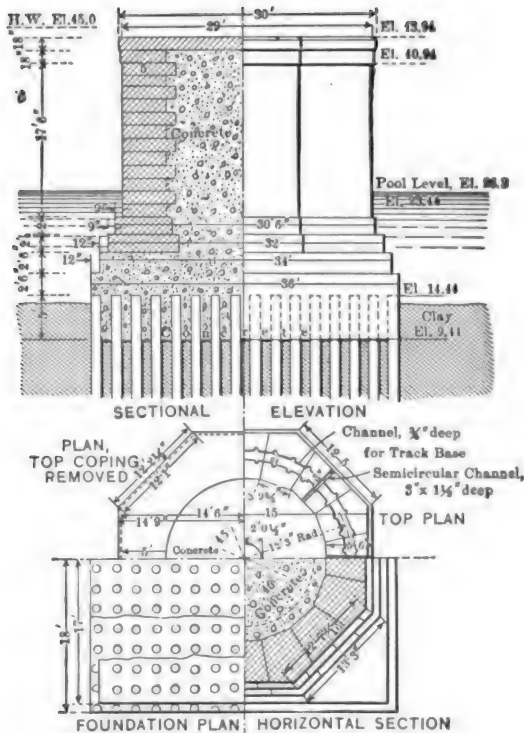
PIVOT PIER, ILLINOIS RIVER BRIDGE.
